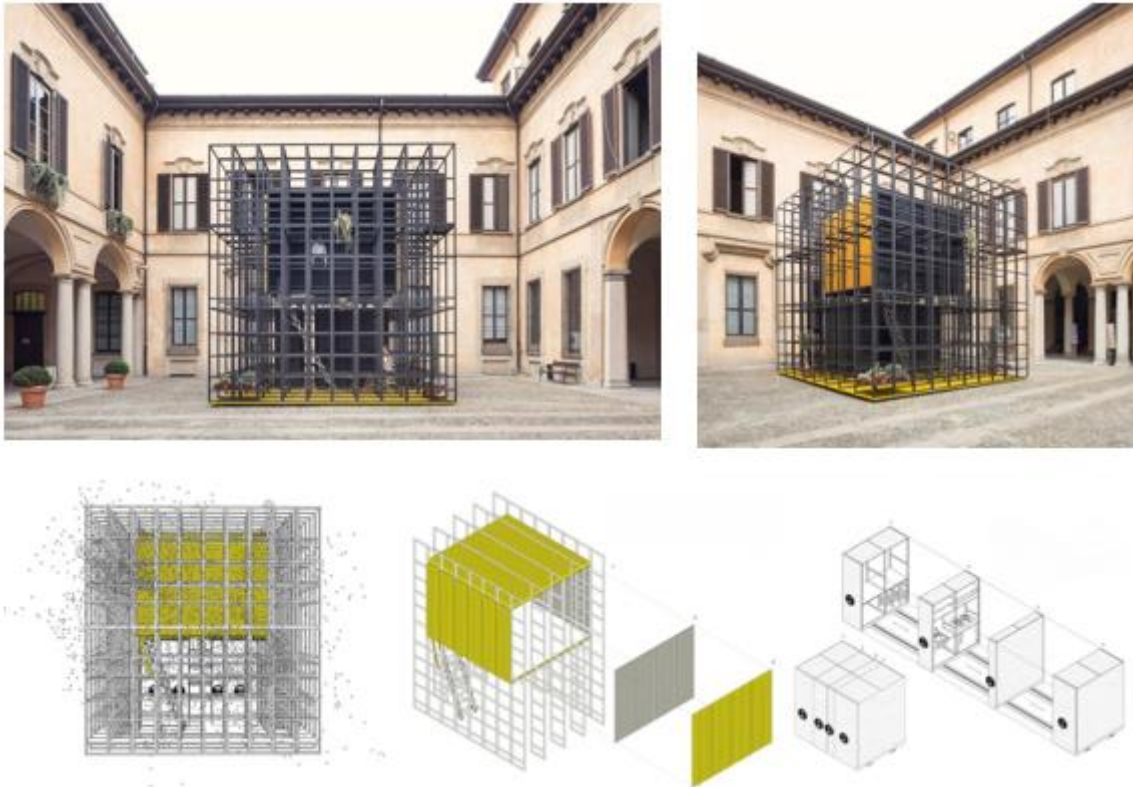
RAM house or Airplane mode house building (space caviar) [112].
